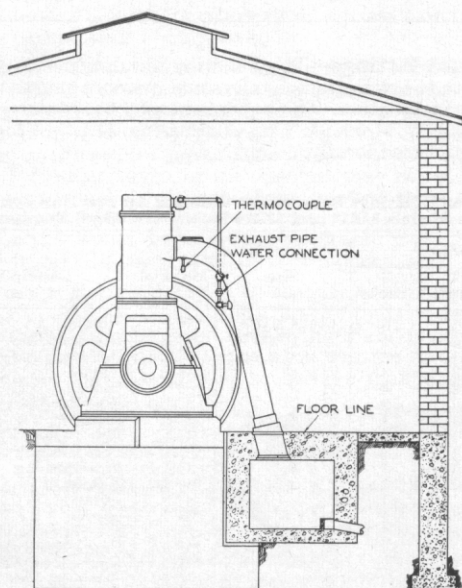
Individual Exhaust Pipe and Underground Conduit Arrangement (99YKA62)
